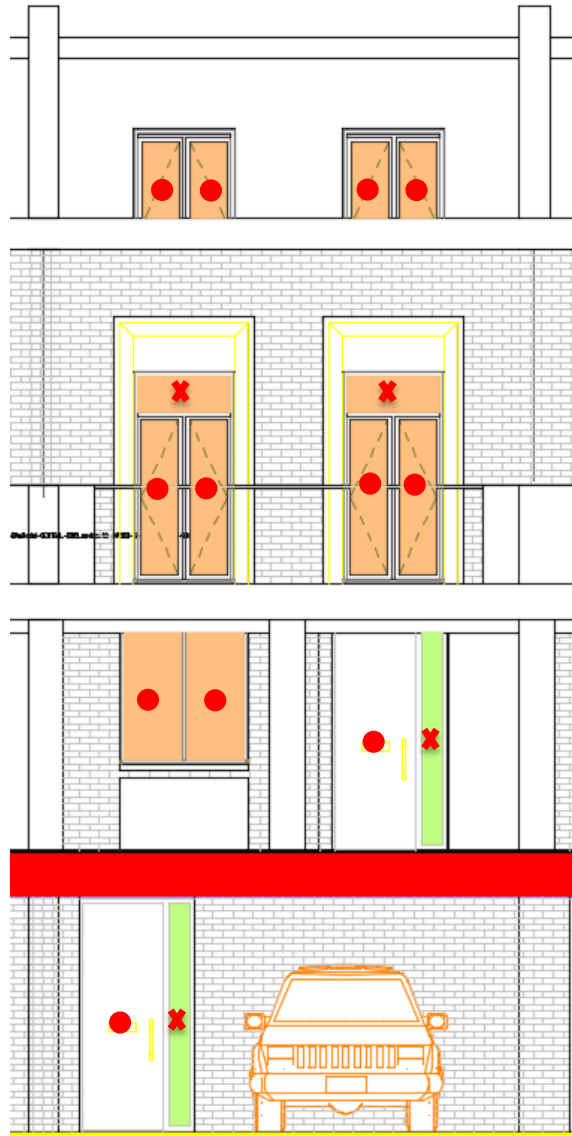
House Type 1 West Facing Elevation: Location of Openings
